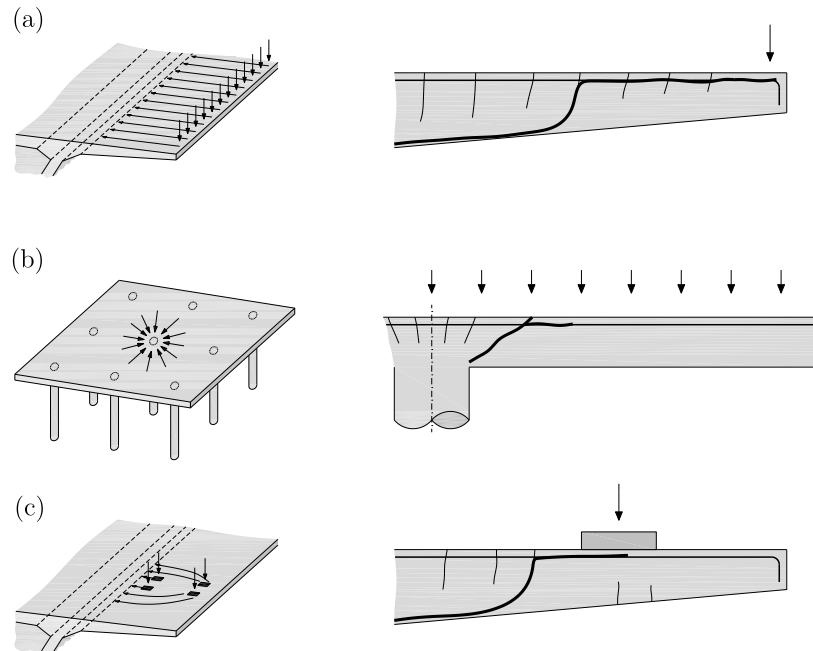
Shear transfer modes and typical failure crack patterns: (a) shear developing in a one-way slab; (b) two-way slab supported on columns; and (c) linearly supported slab subjected to concentrated loads
